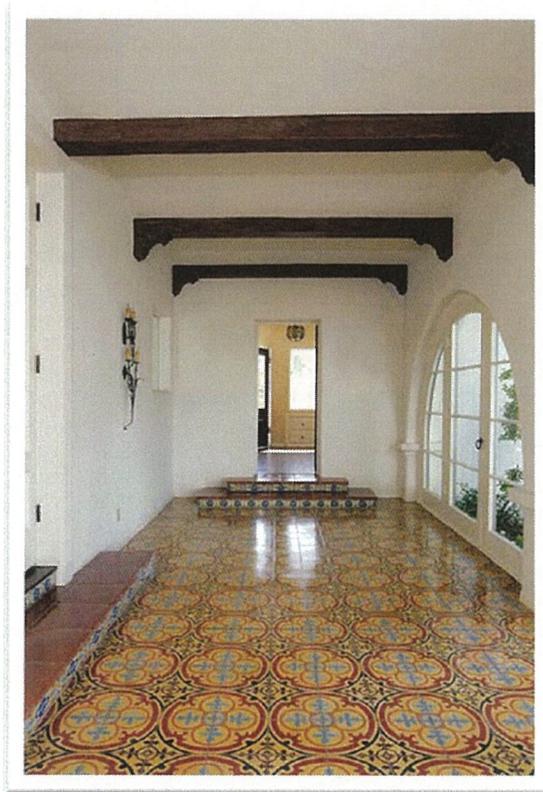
Solarium detail at rear of house along west elevation, looking south (credit, MLS)
